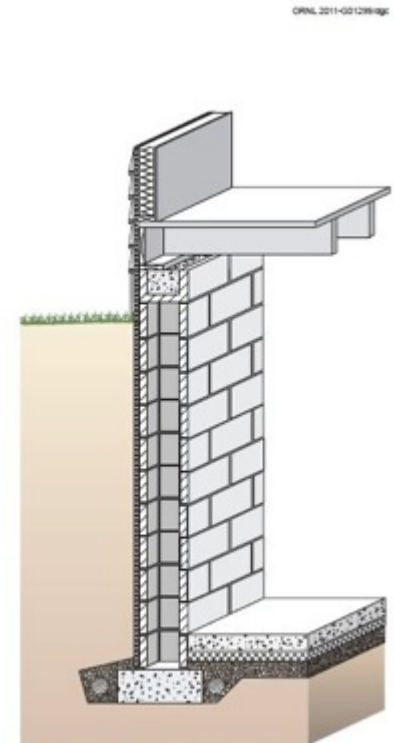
Concrete Masonry Basement Wall with Exterior Insulation
